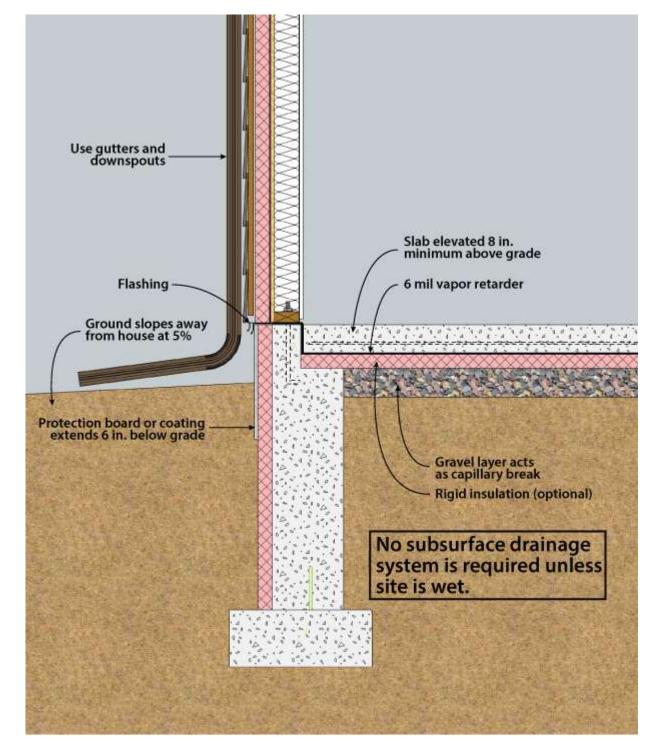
Drainage Techniques for Slab-on-Grade Foundations
